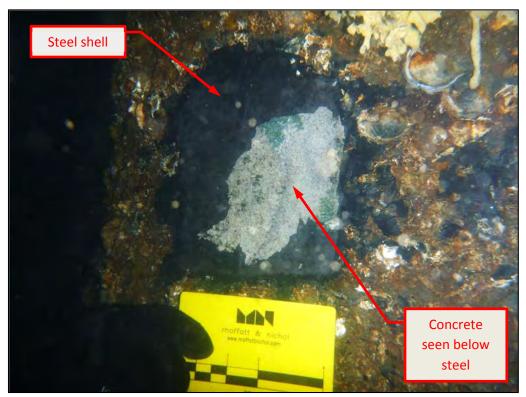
Mid-height Level II at batter Pile 13:G. The partially corroded steel pipe was removed to expose the interior concrete fill.
